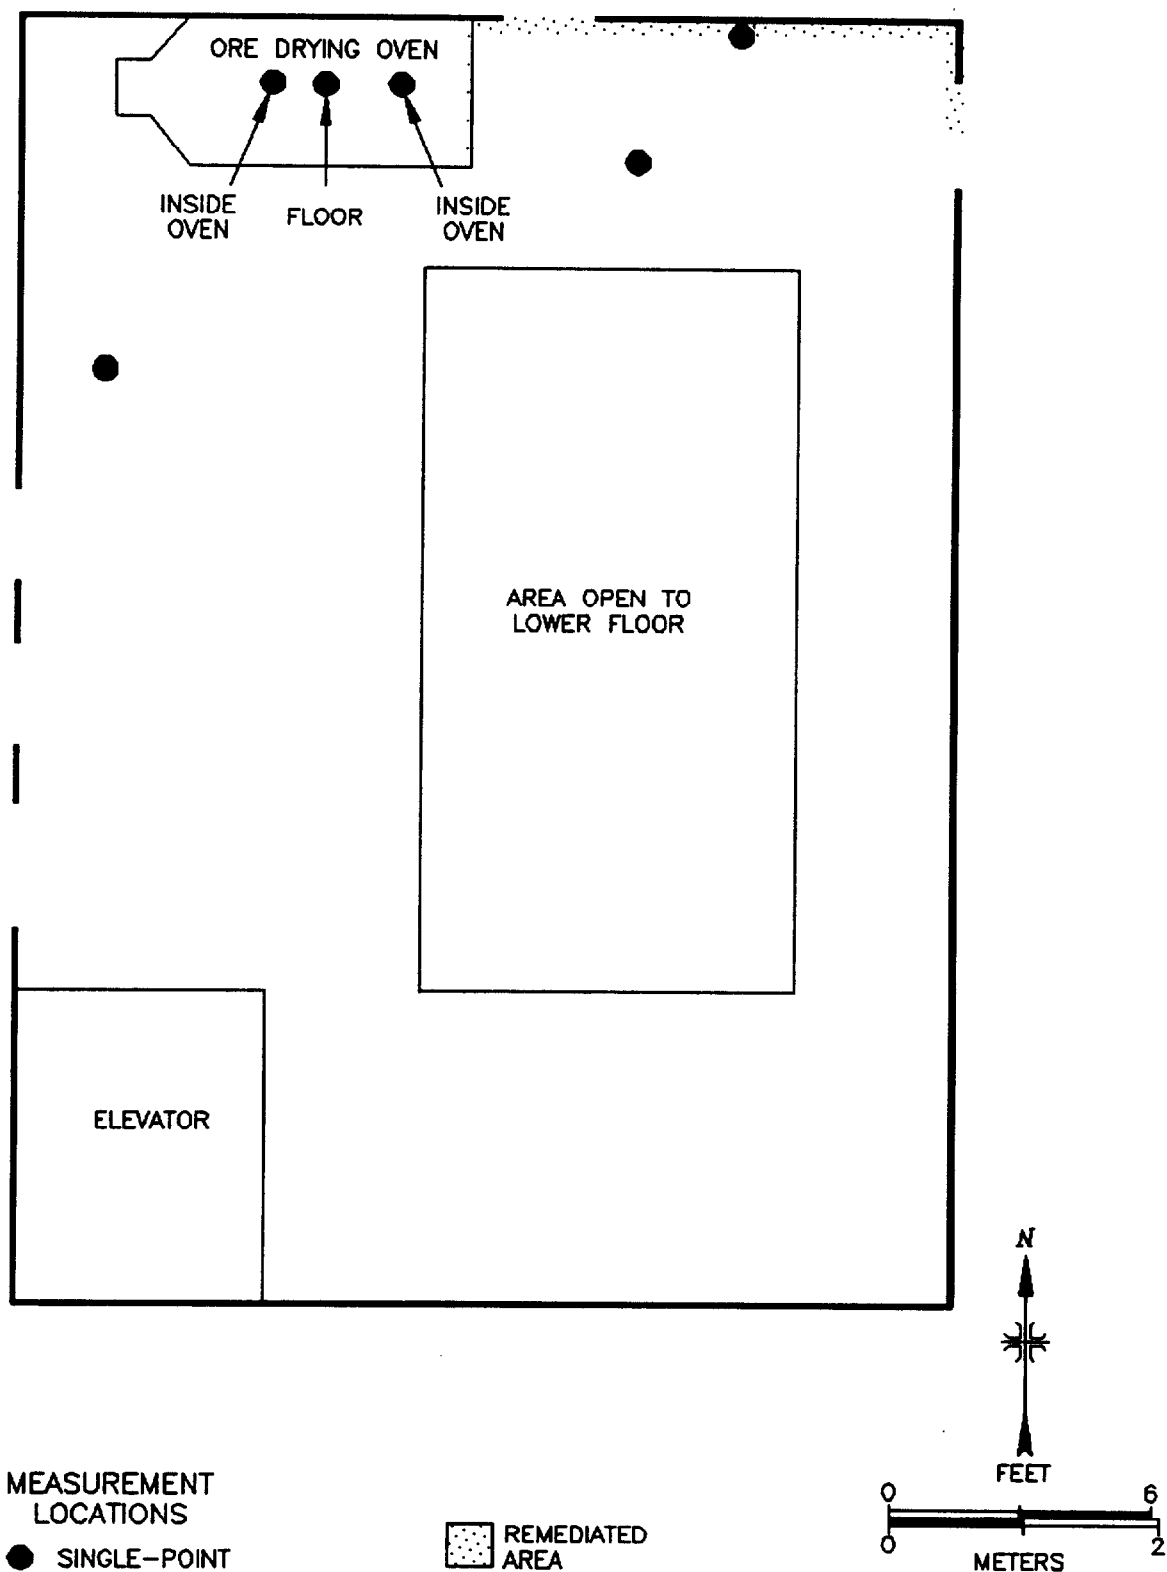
Building 23, Crusher Room, Second Floor — Remediated Areas and Measurement Locations
